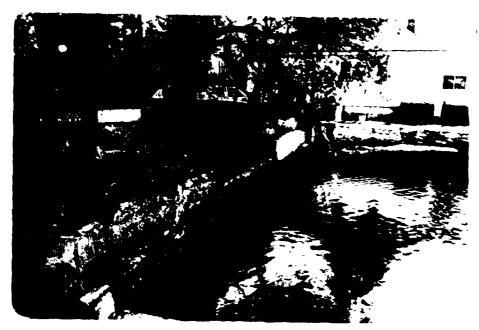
UPSTREAM FACE OF DAM NOTE: DETERIORATION OF CONCRETE
